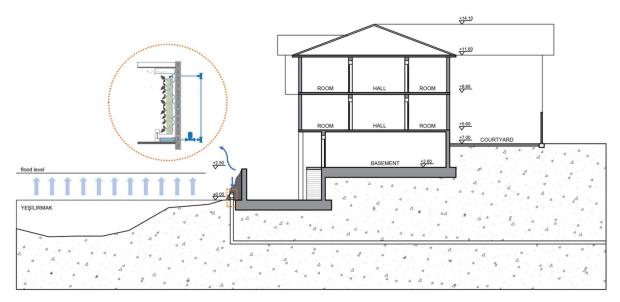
Green wall design and evacuation drainage (Drawn by the authors)
